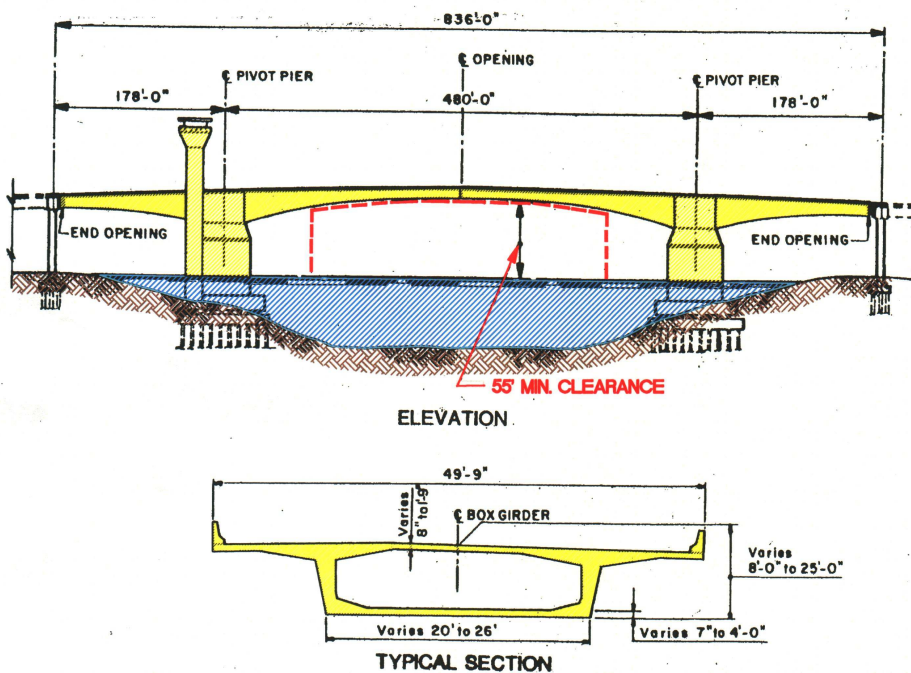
WEST SEATTLE SWING BRIDGE; CAST-IN-PLACE, POST TENSIONED, CONCRETE BOX GIRDER, MOVEABLE SPANS
